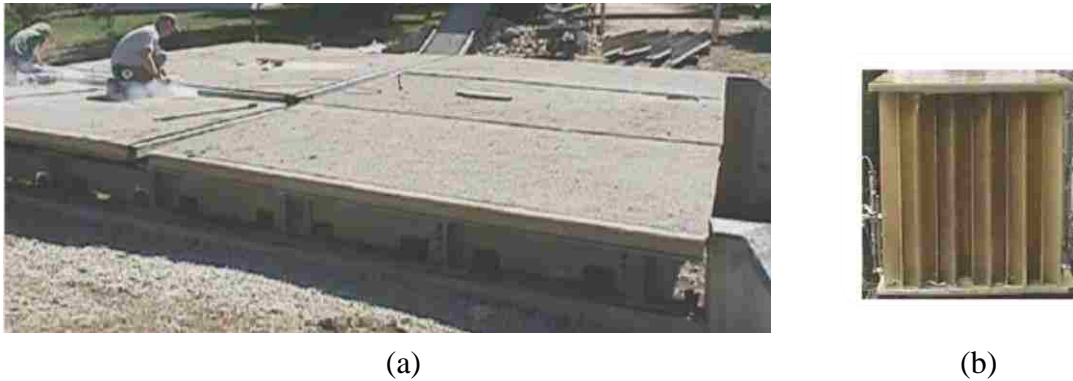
The Johns St. bridge in St. James, MO (a) Bridge overview and (b) Honeycomb core
